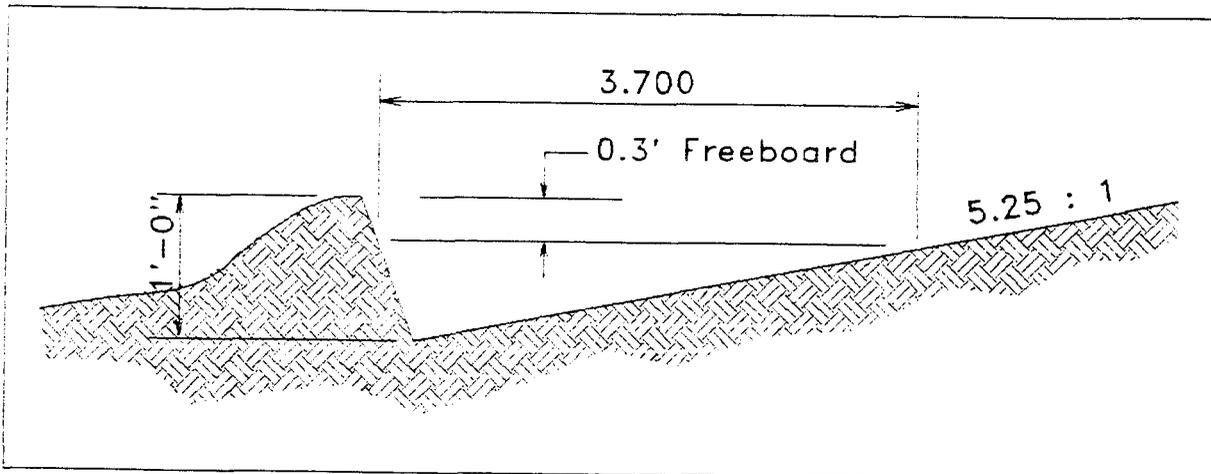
Typical Ditch Cross Section 3/4" = 1'
